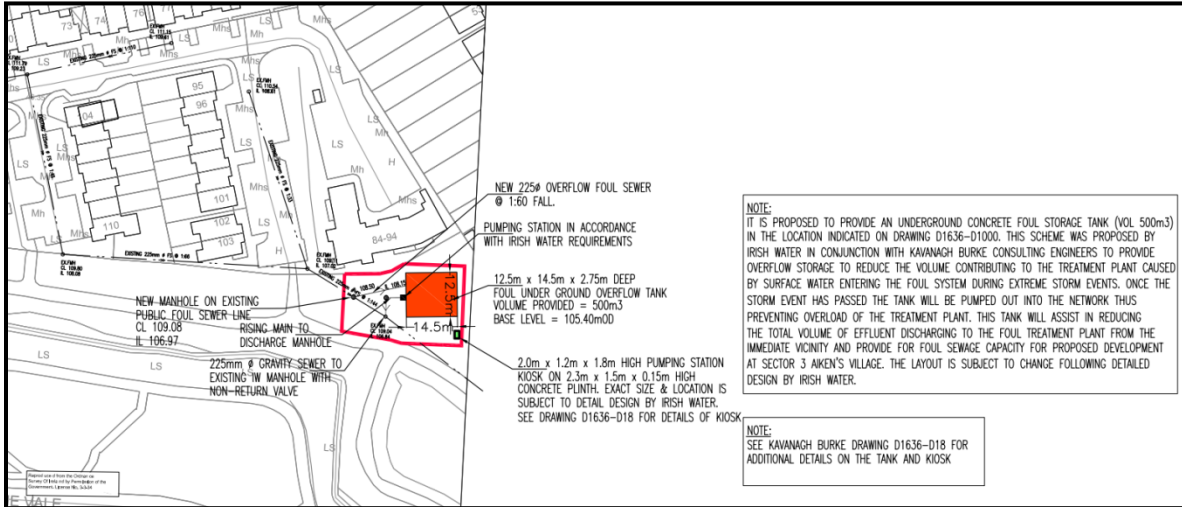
Proposed attenuation tank site layout (Source: Kavanagh Burke Consulting Engineers).
